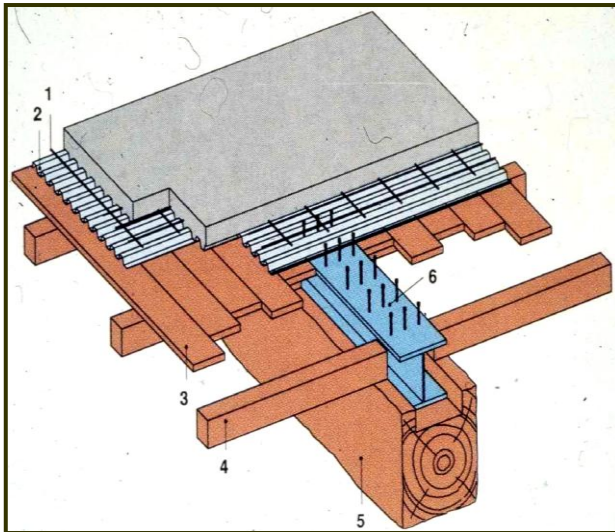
Multi-composite system by using steel profiles, trapezoidal sheeting and cast concrete.
